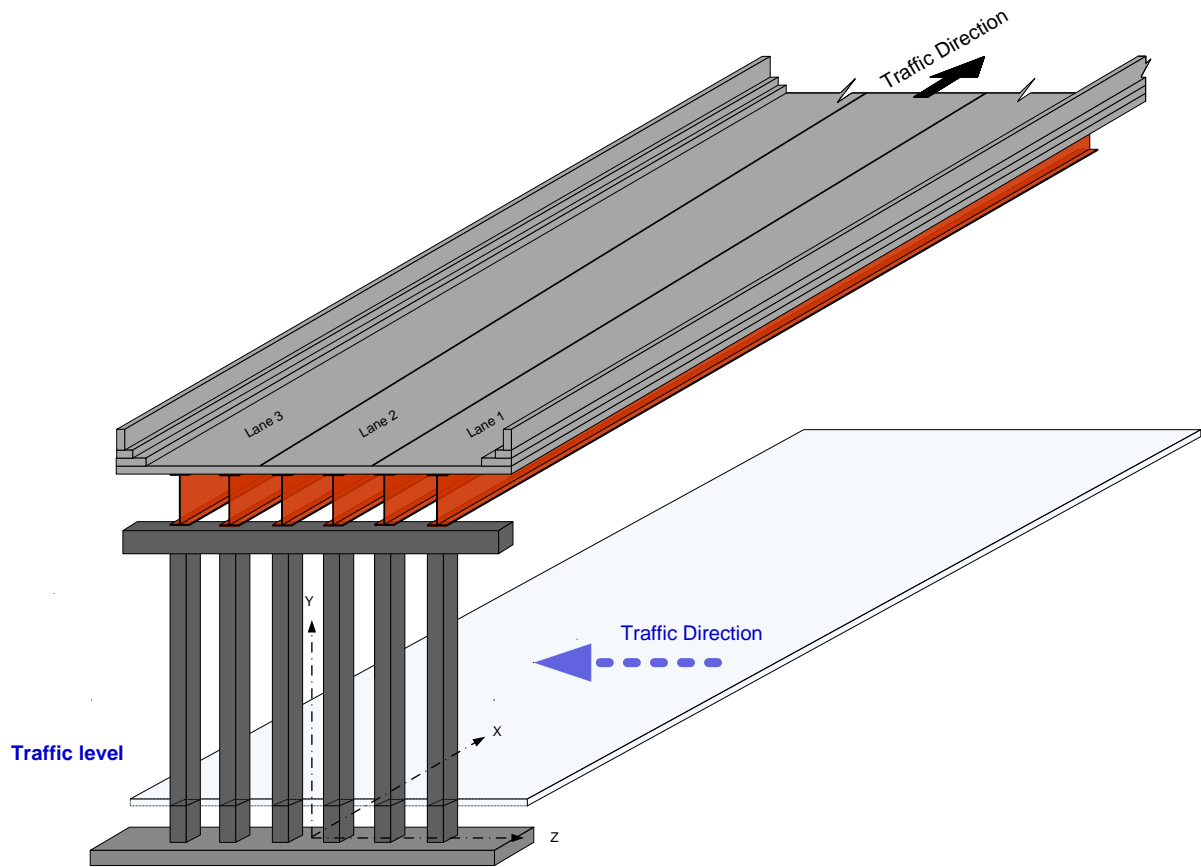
a: Typical slab-on-steel-girder bridge columns.
